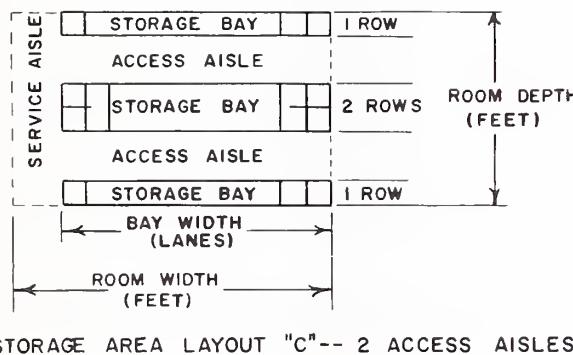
Storage area layout patterns for standard pallet rack storage.
